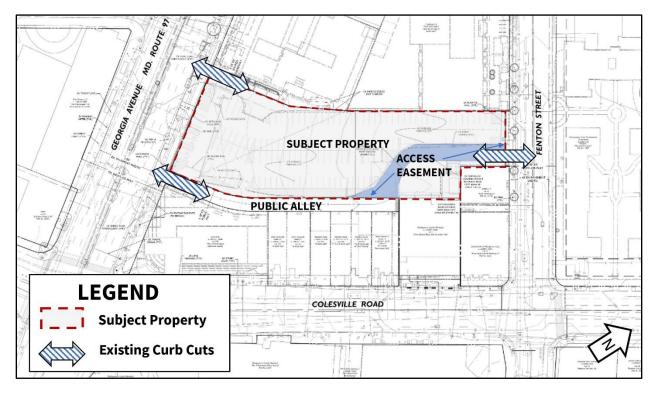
Exhibit showing existing circulation and curb cuts adjacent to and within Subject Property
